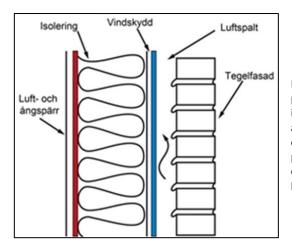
Outline to show an air/vapour barrier that prevents hot, moist indoor air from penetrating the insulation, which would give moisture damage. The air/vapour barrier is always placed on the warm side of the building envelope. Weather and wind protection is placed outside the building envelope in order to prevent the wind blowing through the building envelope, and to protect from precipitation.
